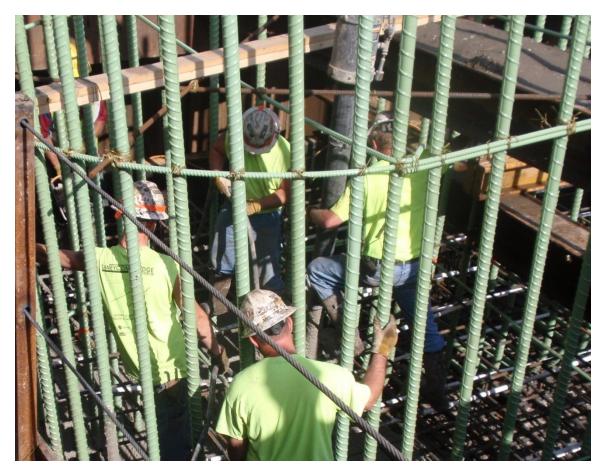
US 34 Bridge Pier 4 footing concrete placement
